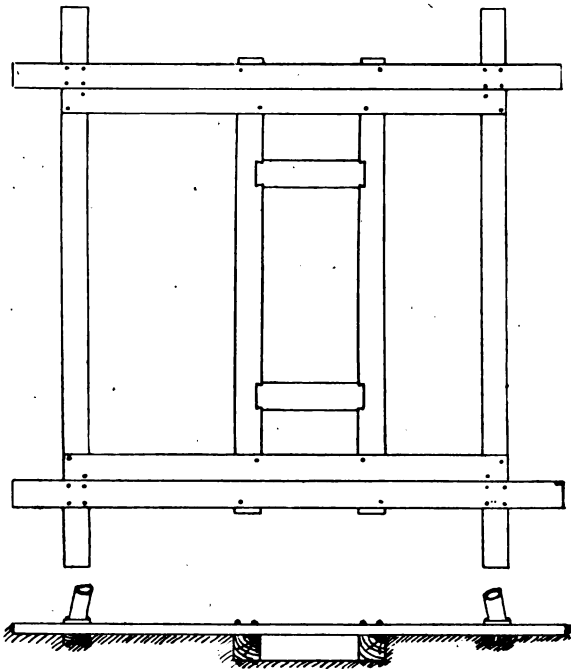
DERRICK FOUNDATION IN PLAN AND ELEVATION.
